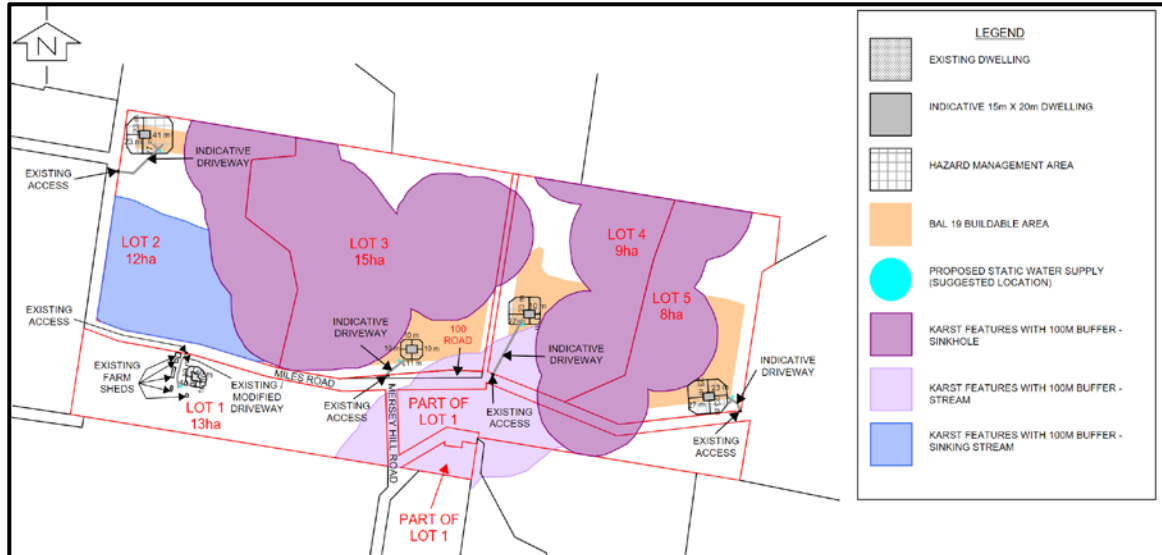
Indicative building envelopes shown in the Bushfire Hazard Management Plan.
